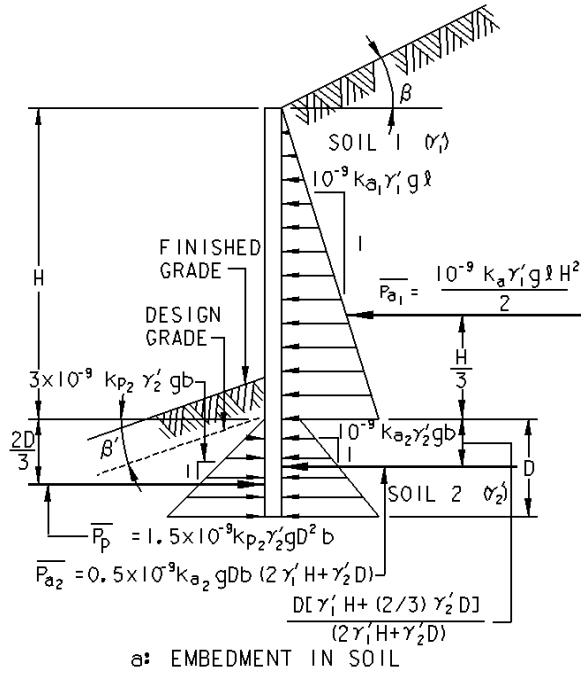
Simplified Earth Pressure Distributions for Permanent Nongravity Cantilevered Walls with Discrete Vertical Wall Elements
